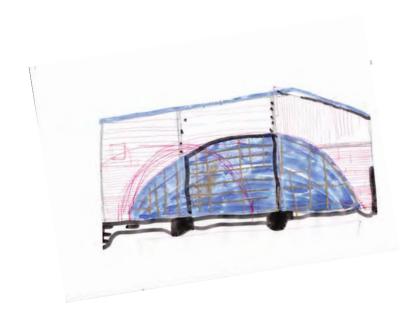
Plans in progress, from sketch to print to sketch plans and paint plans reinforcing the branch logic into space.
